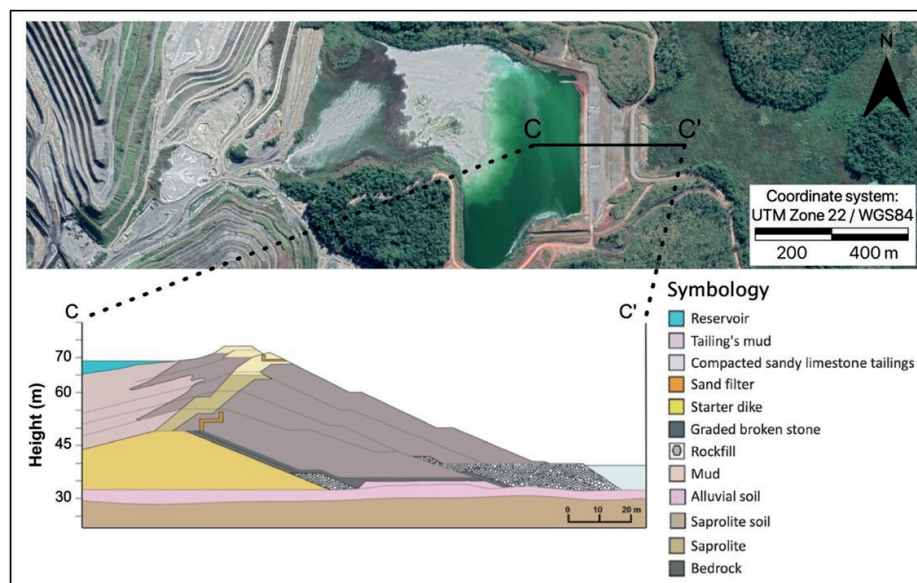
Typical section of B1 Dam (modified from Oliveira, 2021) (Cajati 2020).
